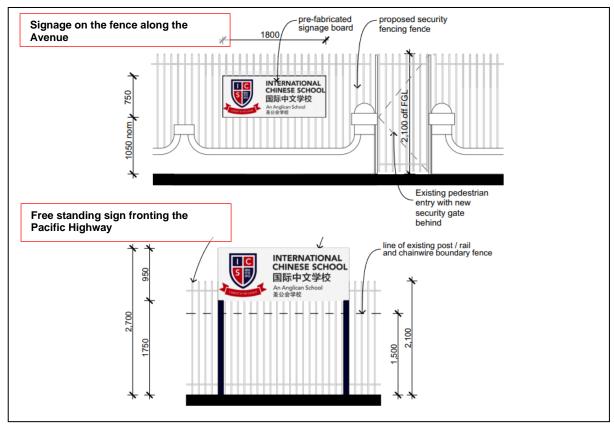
| Proposed signage (Source: Applicant's SRTS)
